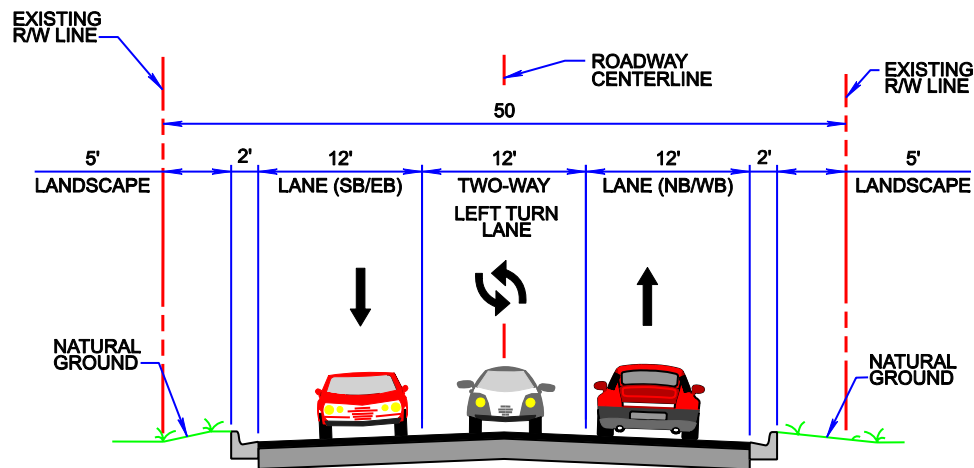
J NW 121st Way North of FEC Railroad (2018)
